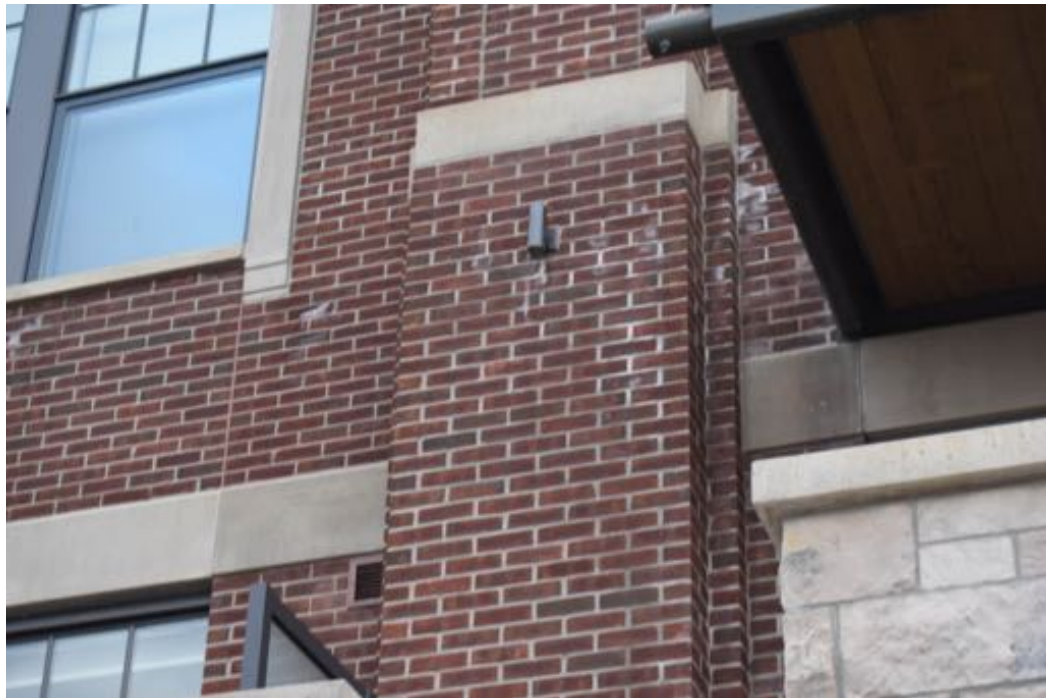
North elevation, significant staining visible from the balcony scuppers on the brick veneer.
